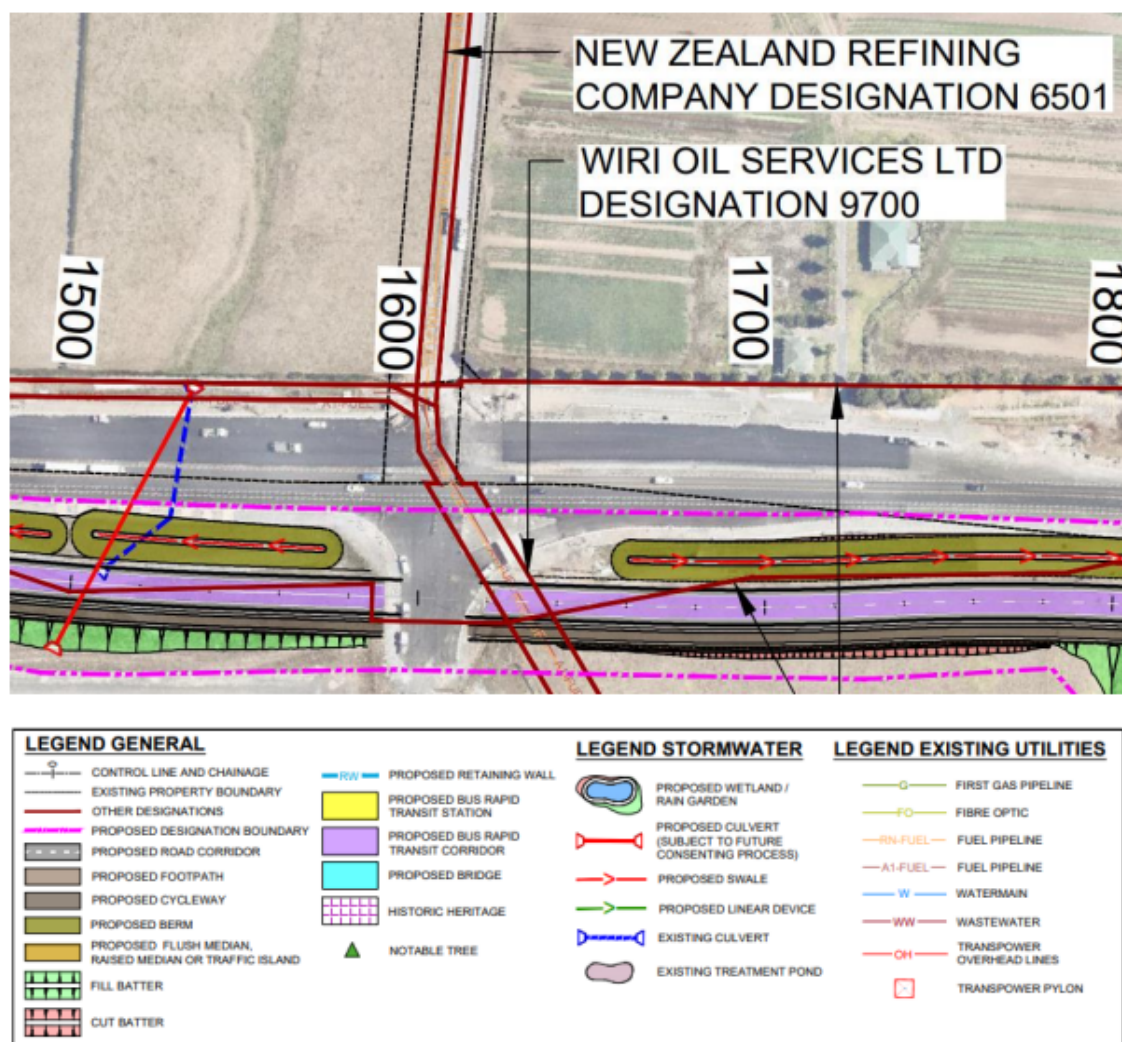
Excerpt from General Arrangement Layout Plan – NOR4A
